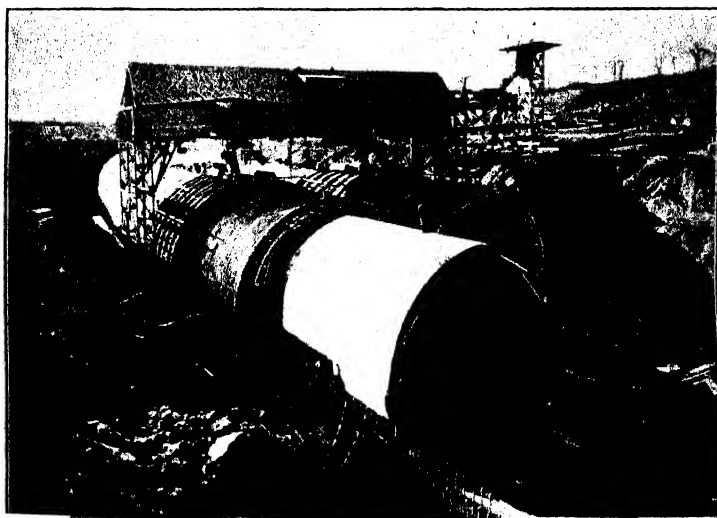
Telescopic conduit forms of steel, River des Peres, St. Louis.
